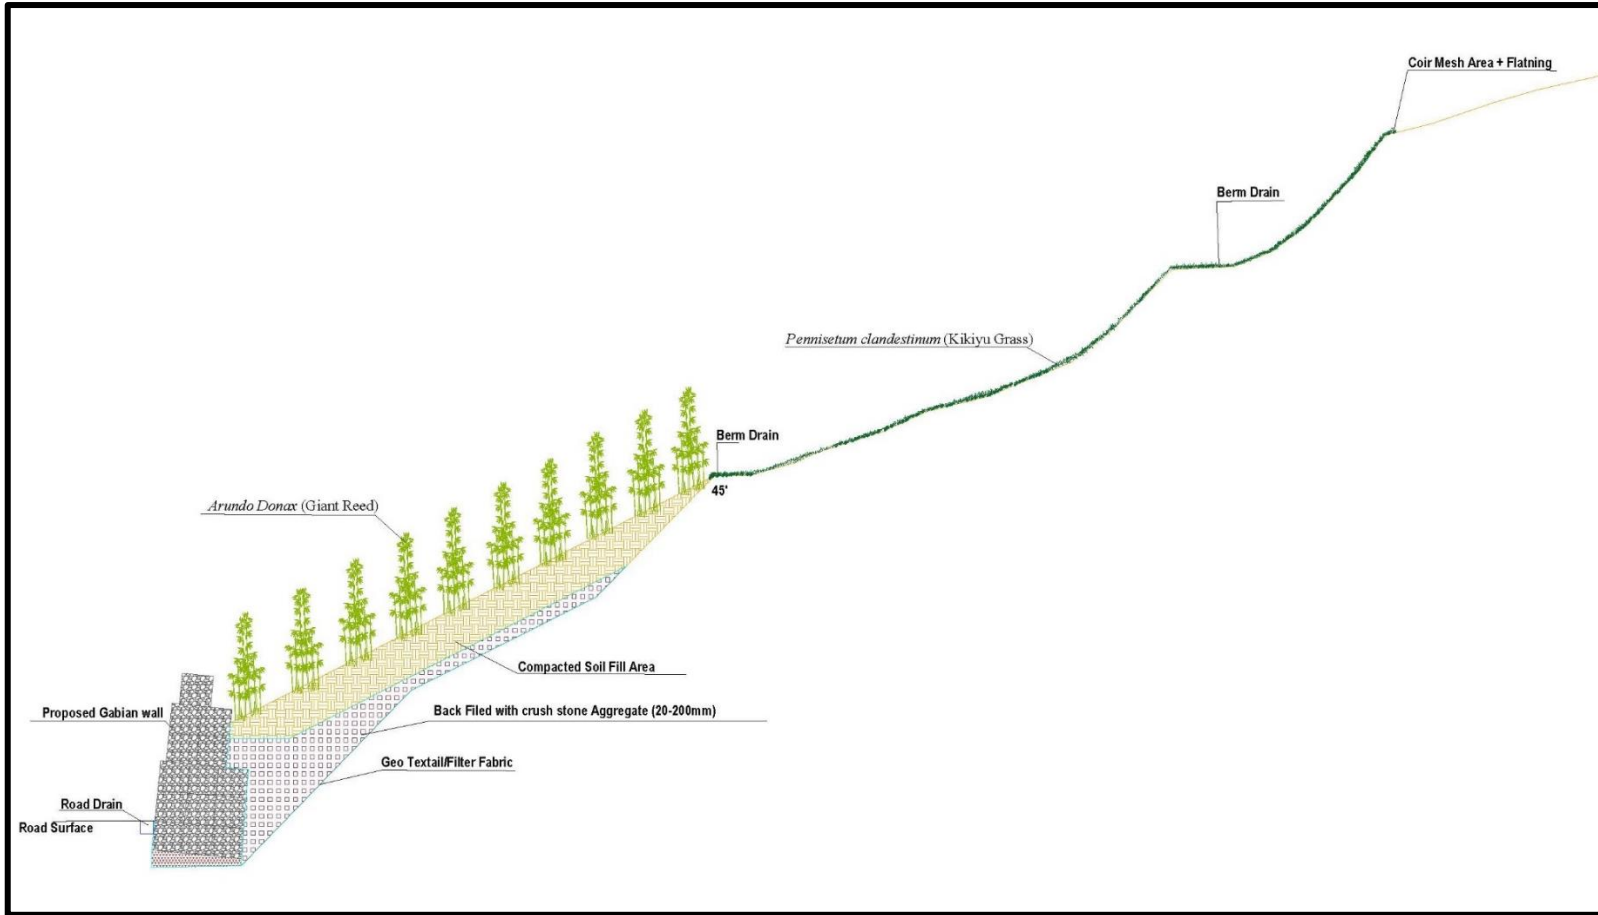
Side Elevation view of section between culvert 75-6 and 75-7
